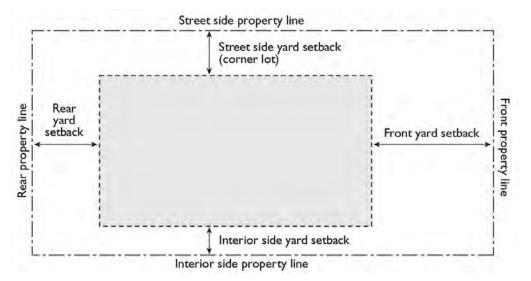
DETERMINING SETBACKS (YARDS)
